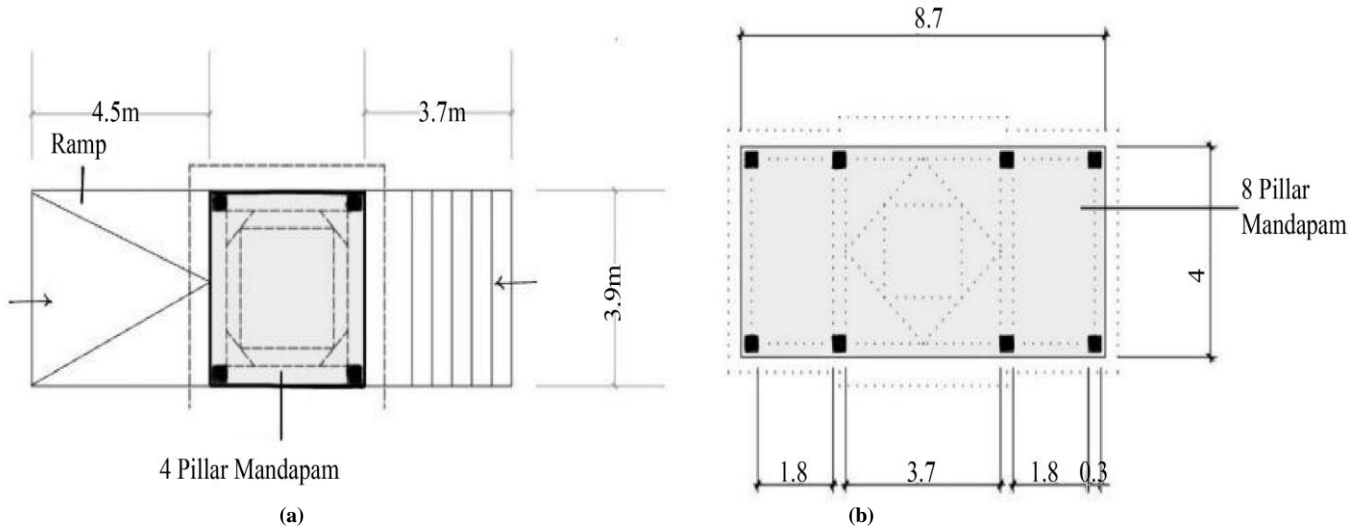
(a) Plan of 4 Pillar Mandapam, and (b) Plan of 8 Pillar Mandapam adjacent to the Gangabhai Chatram.
